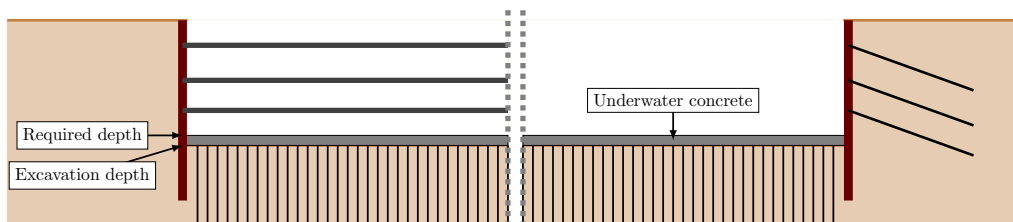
Casting of underwater concrete floor and dewatering of the building pit
